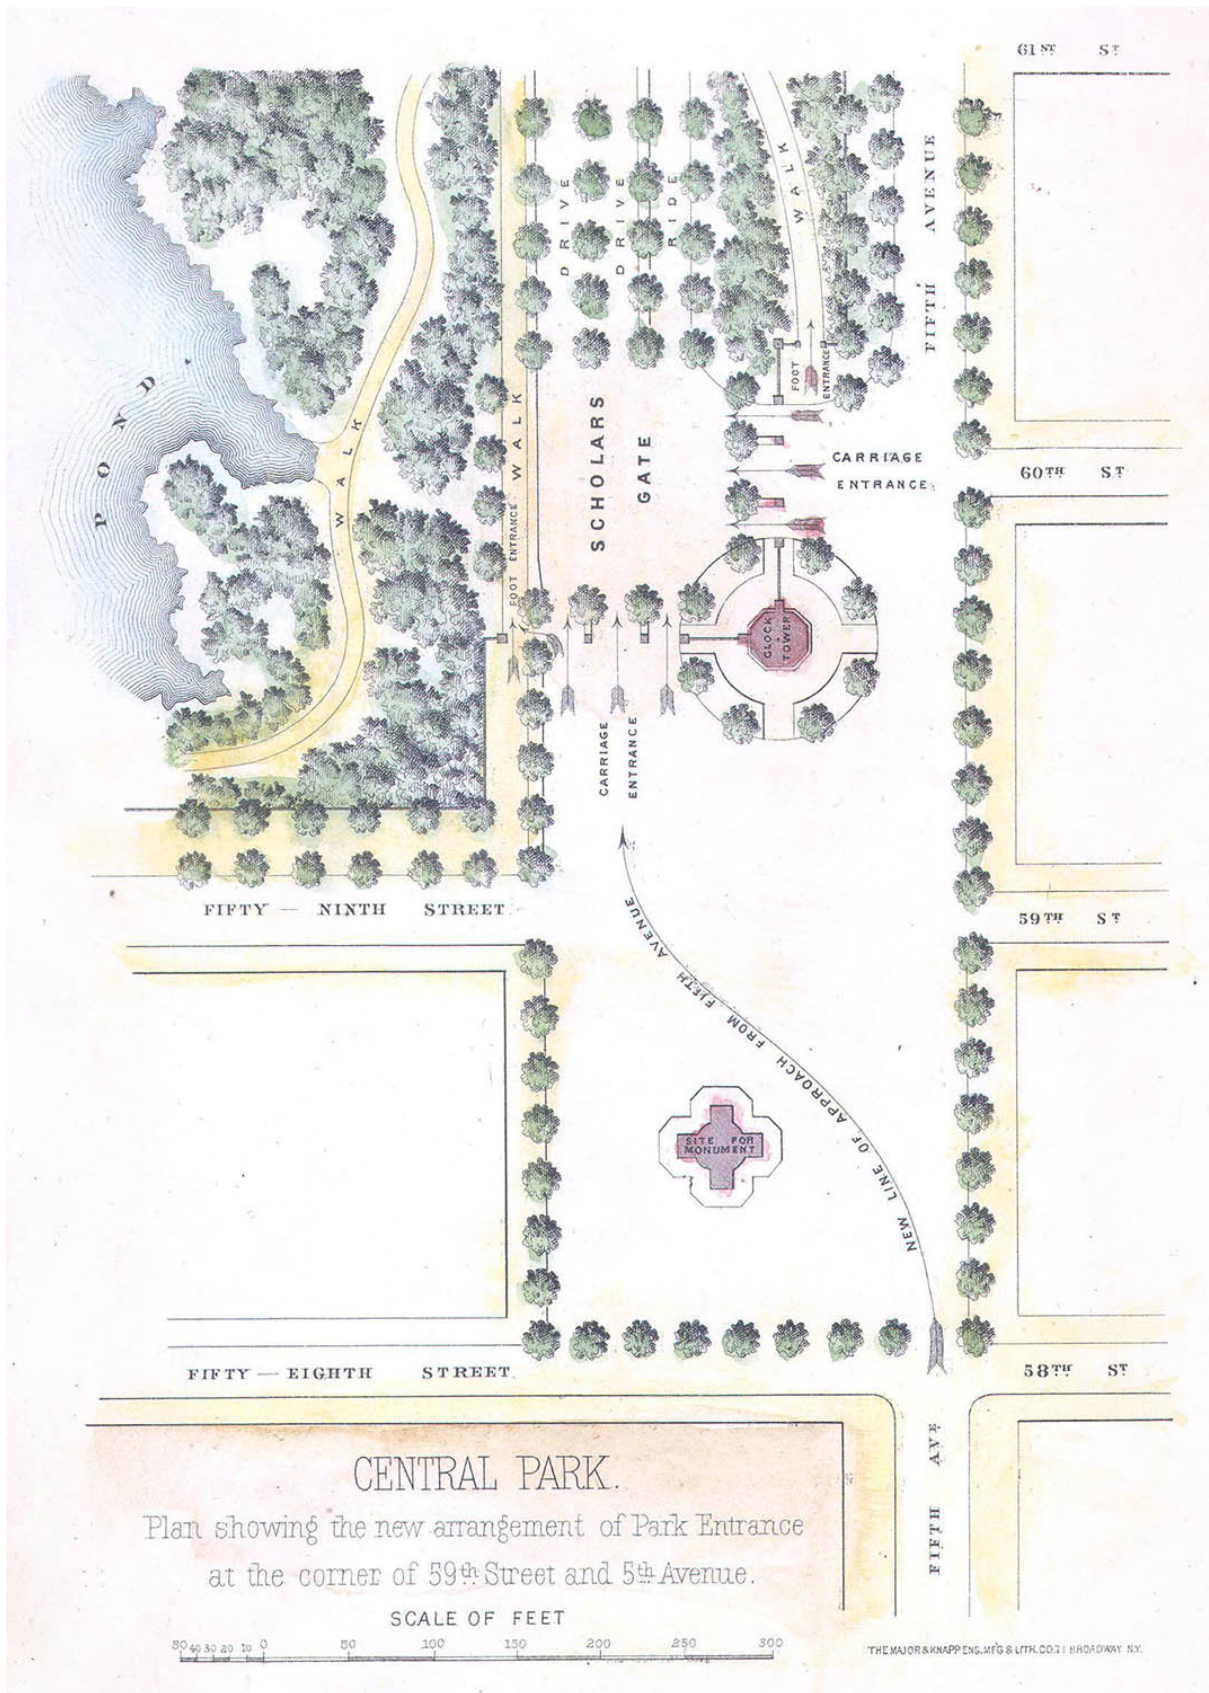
'Plan showing the new arrangement of Park Entrance [Scholars' Gate] at the corner of 59th Street and 5th Avenue.' The Metropolitan Clubhouse was erected on the corner of 60th Street and Fifth Avenue. (New York Public Library)
